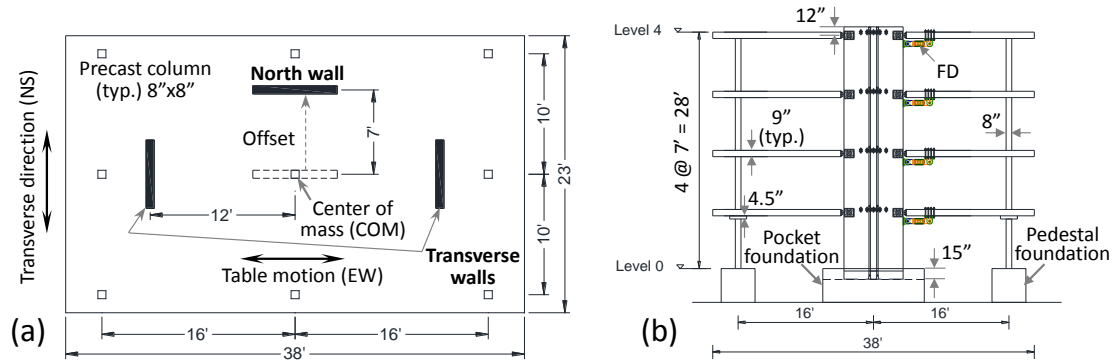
Shake table test specimen: (a) plan view; (b) elevation view.
